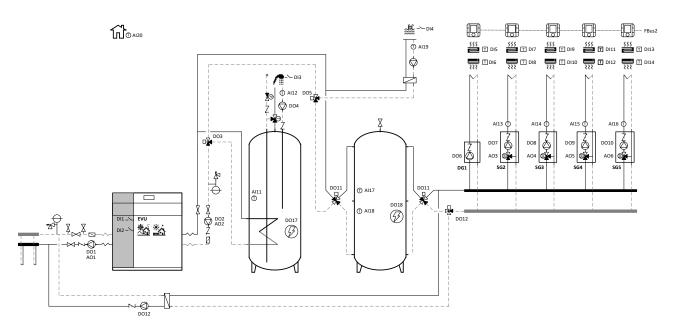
Wiring scheme using one buffer storage tanks (VOLTA W-H-A models).
